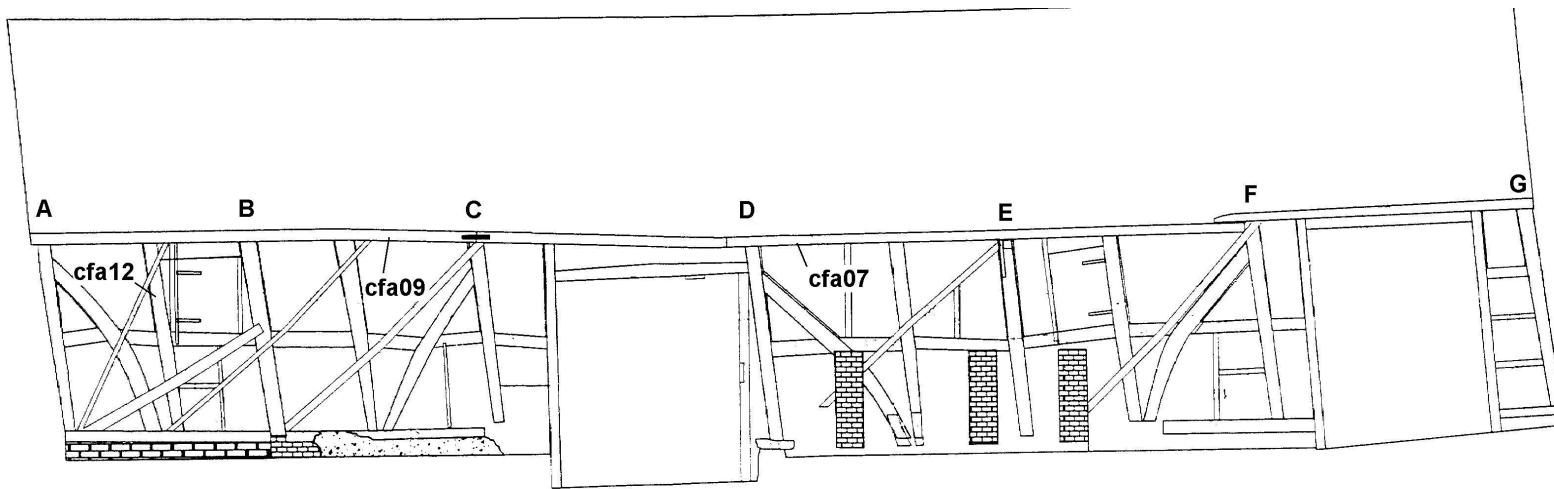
Internal elevation of the west wall showing timbers sampled for dendrochronology
